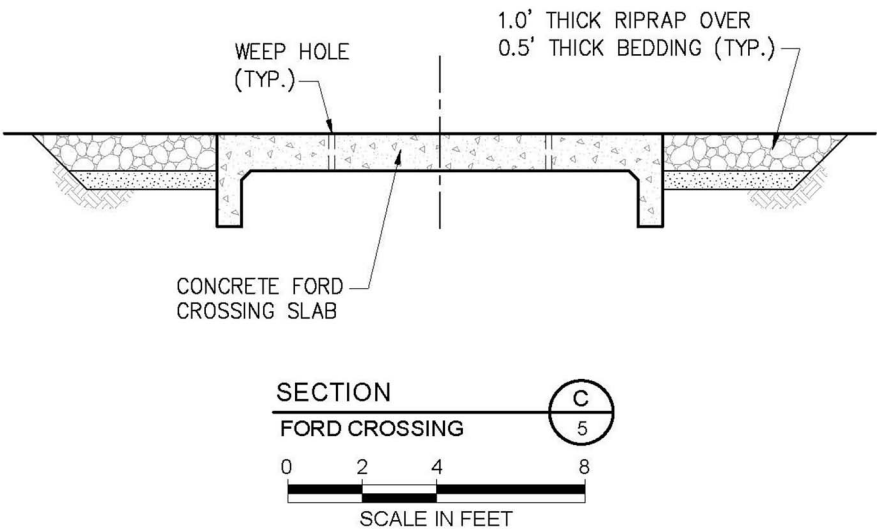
P-4. Section C Ford Crossing, before Dimensioning
